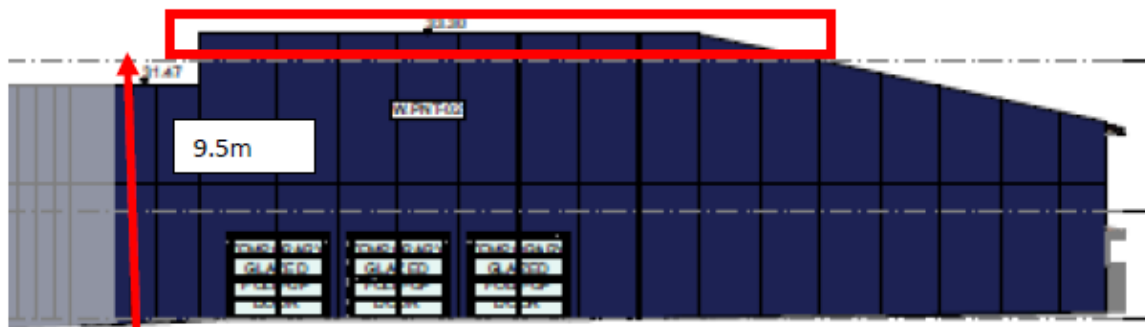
Southern elevation of the proposed development showing in red outline the area of the building exceeding the maximum 9.5m height of buildings standard in the RLEP 2012.
